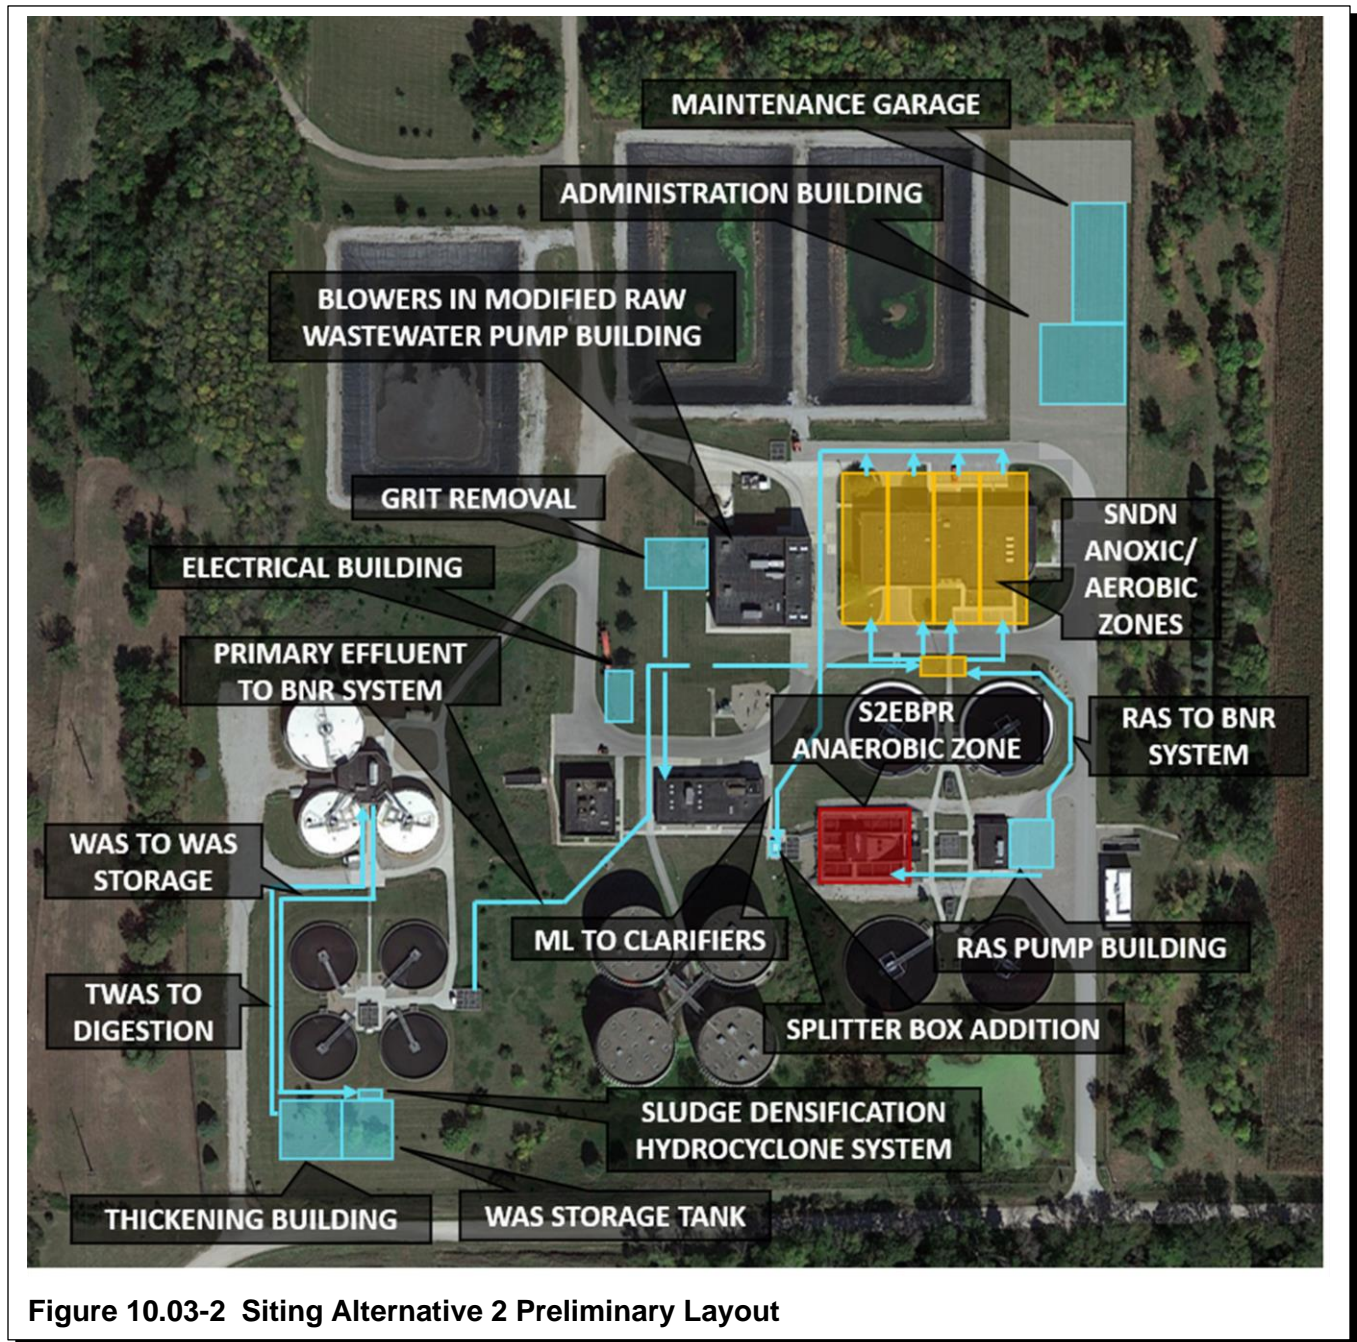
Siting Alternative 2 Preliminary Layout
